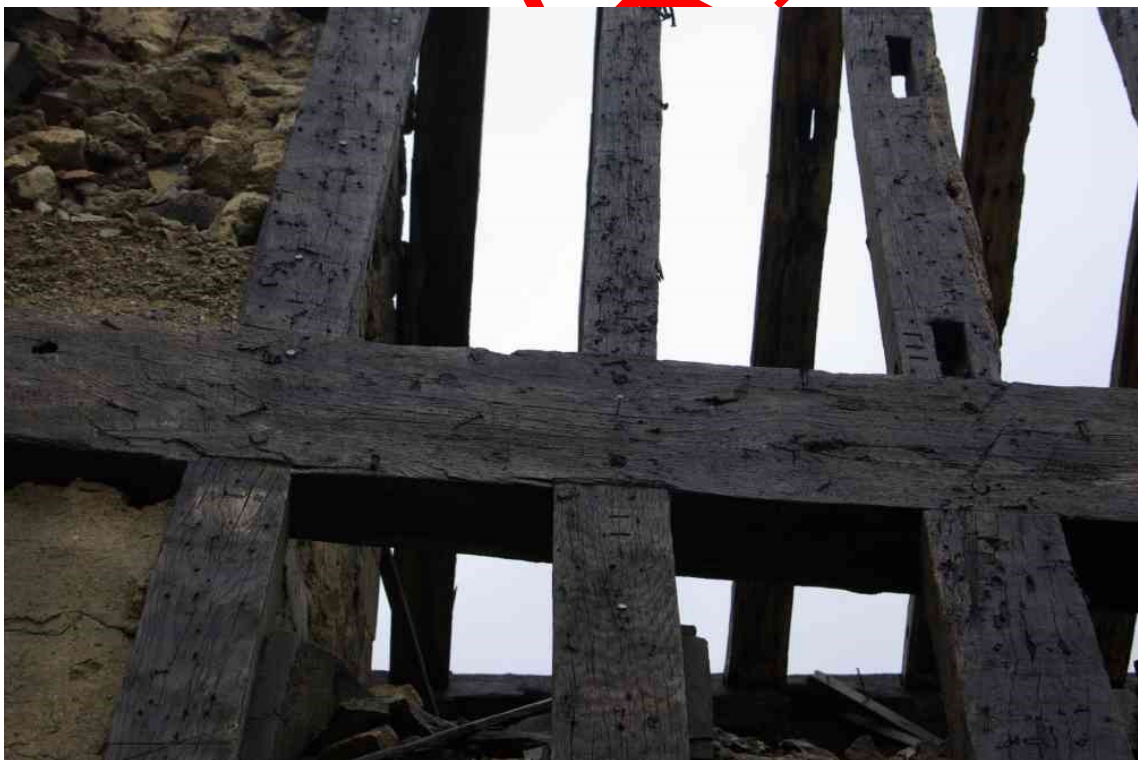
Building 01C. Carpenter's marks, west side of roof.
